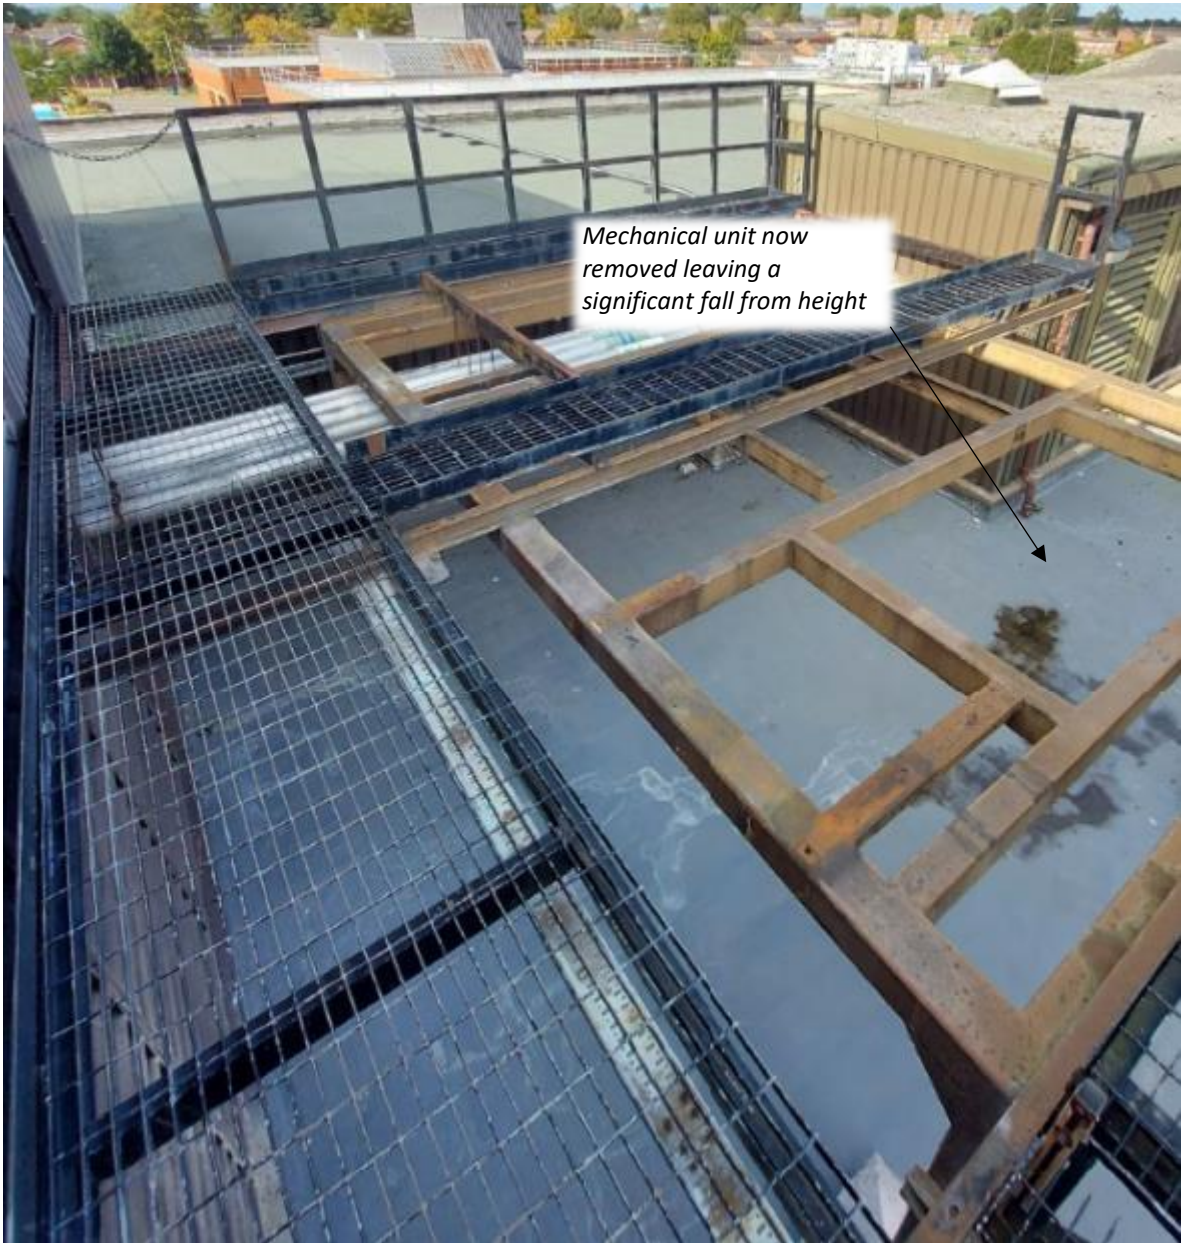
UNPROTECTED FALLS FROM HEIGHT
